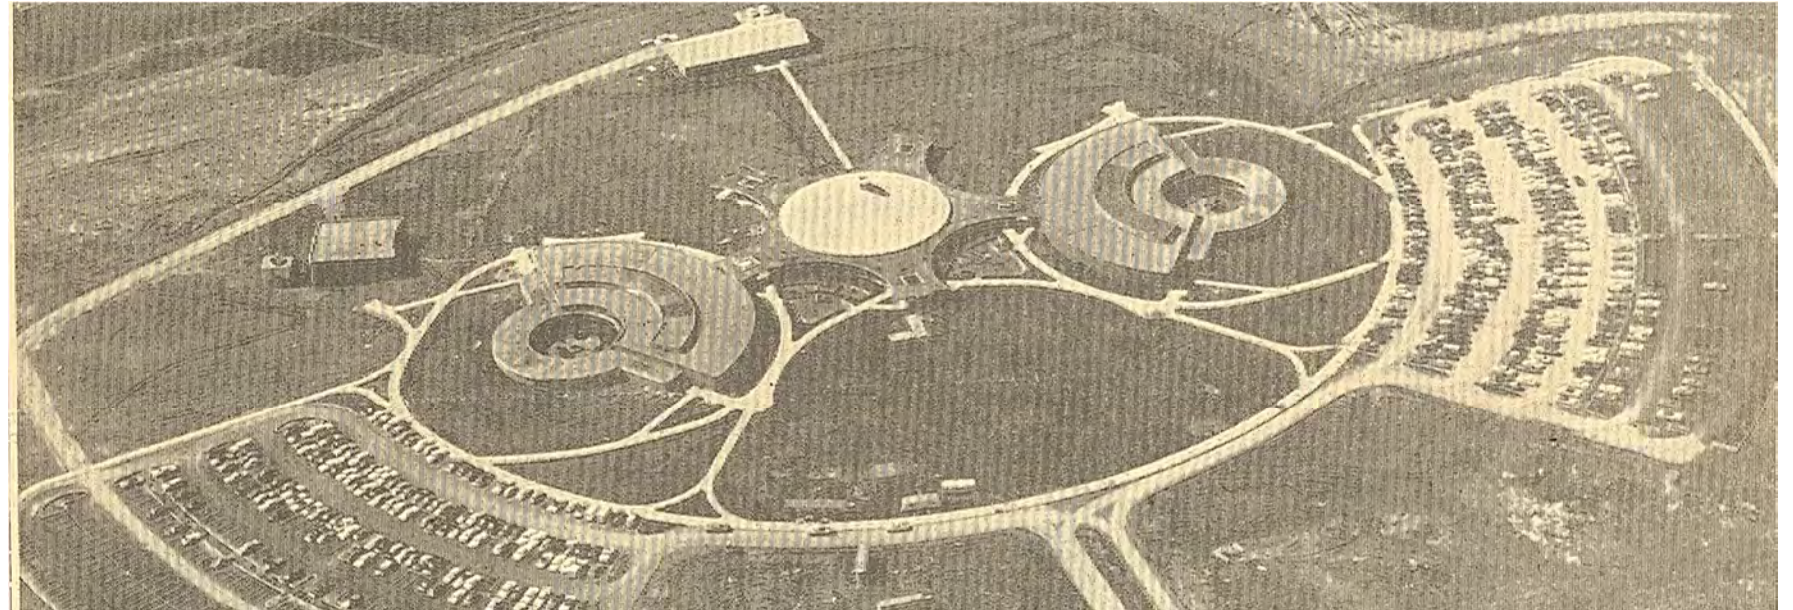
Aerial view of the first phase of construction at the Lake Land College Campus Construction of the Northwest building, Northeast building, library, and powerhouse began in March 1969. Also pictured is the temporary student union building and bookstore (top-most, white roof). Photo dated March 11, 1971.
